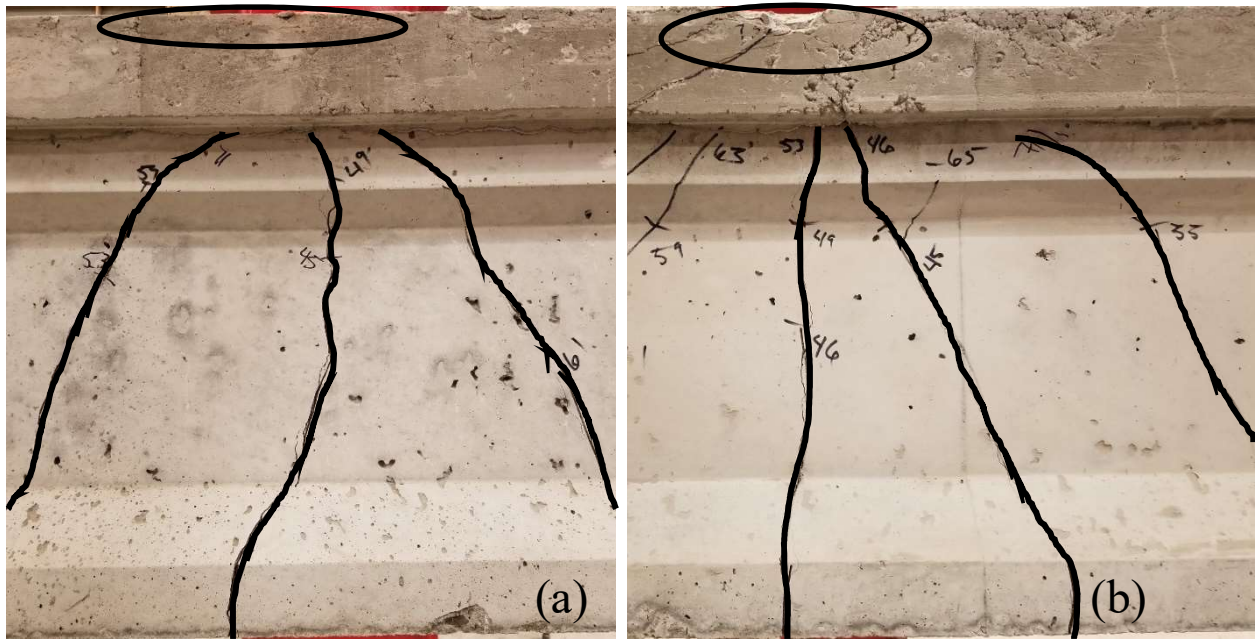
Final flexural cracking under the load point in the RC3-N (a) and RC3-S (b) girders are indicated by dark lines and concrete deck crushing is indicated by dark ovals.
